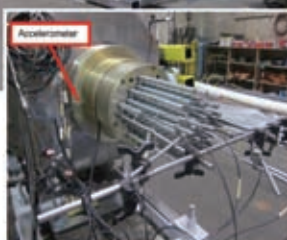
OVM250-43 cable anchor head (adjustable)
